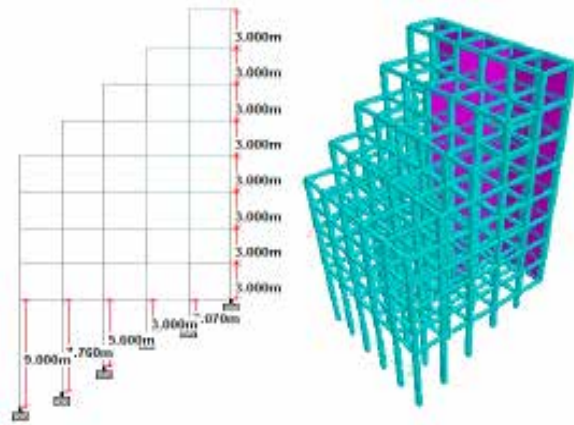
Elevation of T Shape Shear Wall with 30° Slope
